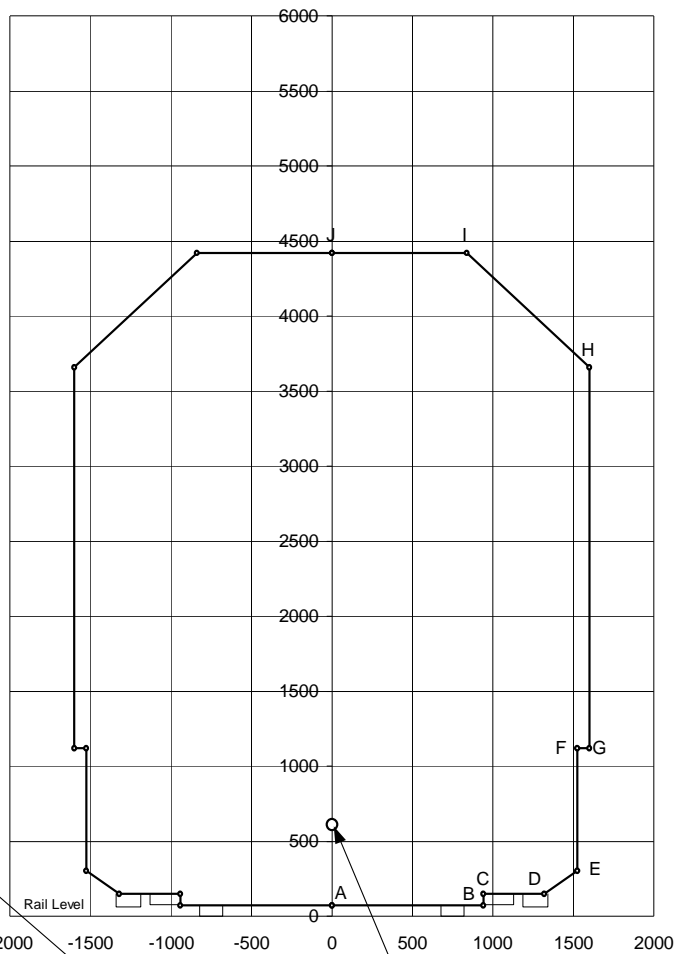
Extended Medium Electric rolling stock outline dimensions
